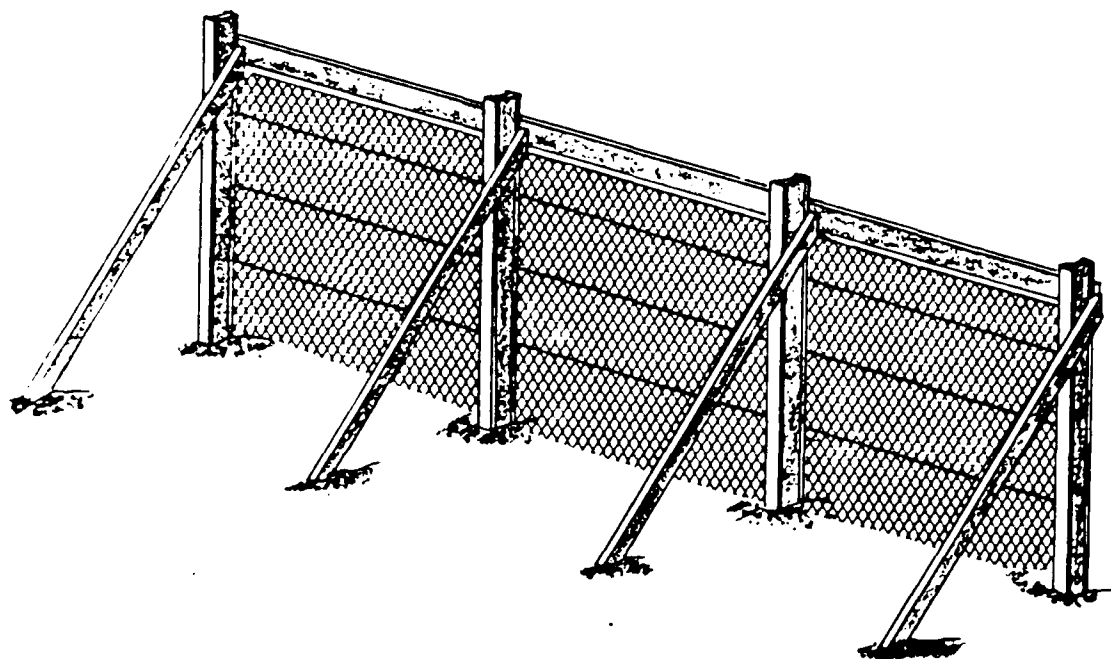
Single line of steel rail, wire-meshed fence as a retarder
